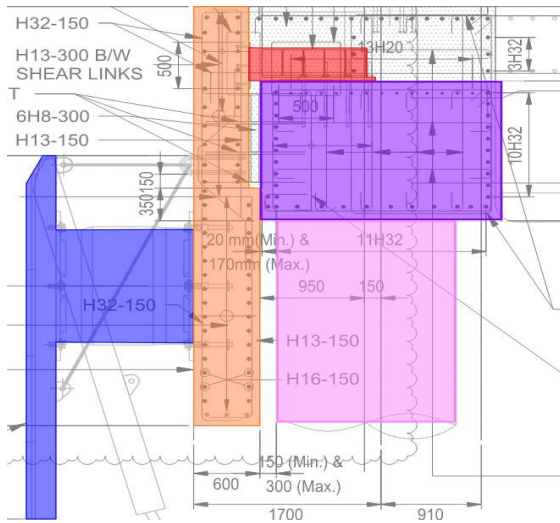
Fender downhang wall (orange) with fender (blue), mounted on H-section (red) that is bolted to the capping beam (purple), which sits on the CBP (pink)
